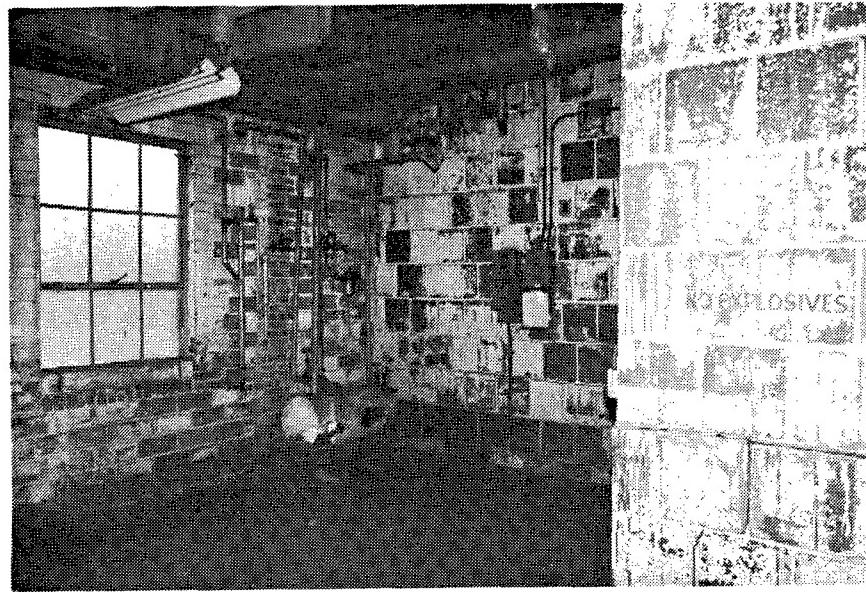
Building 2B-13: Interior view of this Tetryl Cupping Building.
